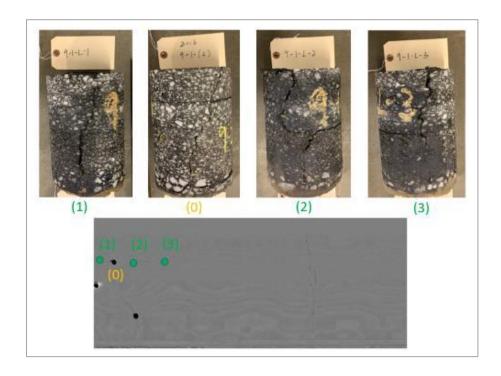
Photo. Cores on Non-Sealed Longitudinal Crack (Site 9)
